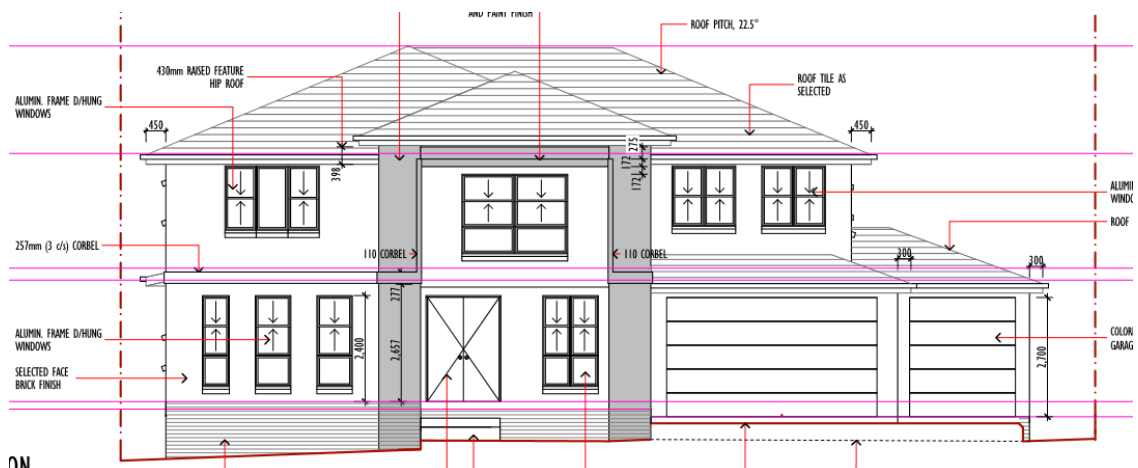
Approved street elevation of No. 72 Murray Farm Road
